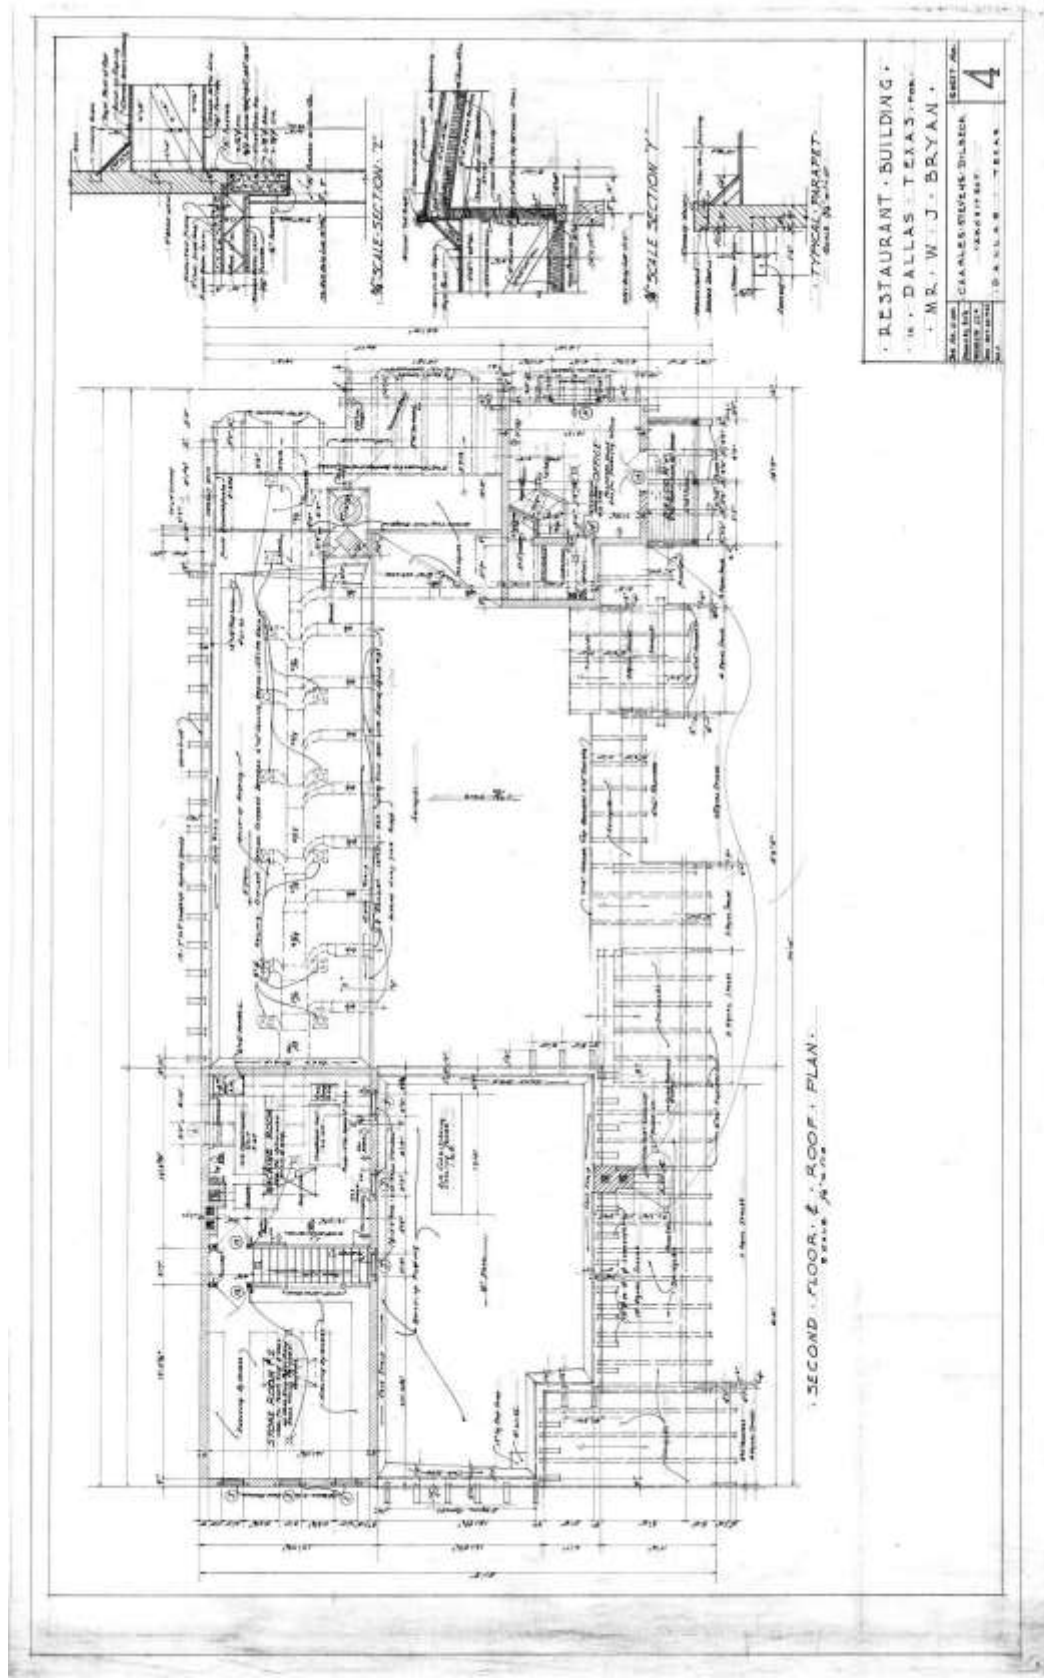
Original architectural drawing by Charles Dilbeck – Second Floor and Roof Plan. Courtesy of Willis Winters, FAIA.
